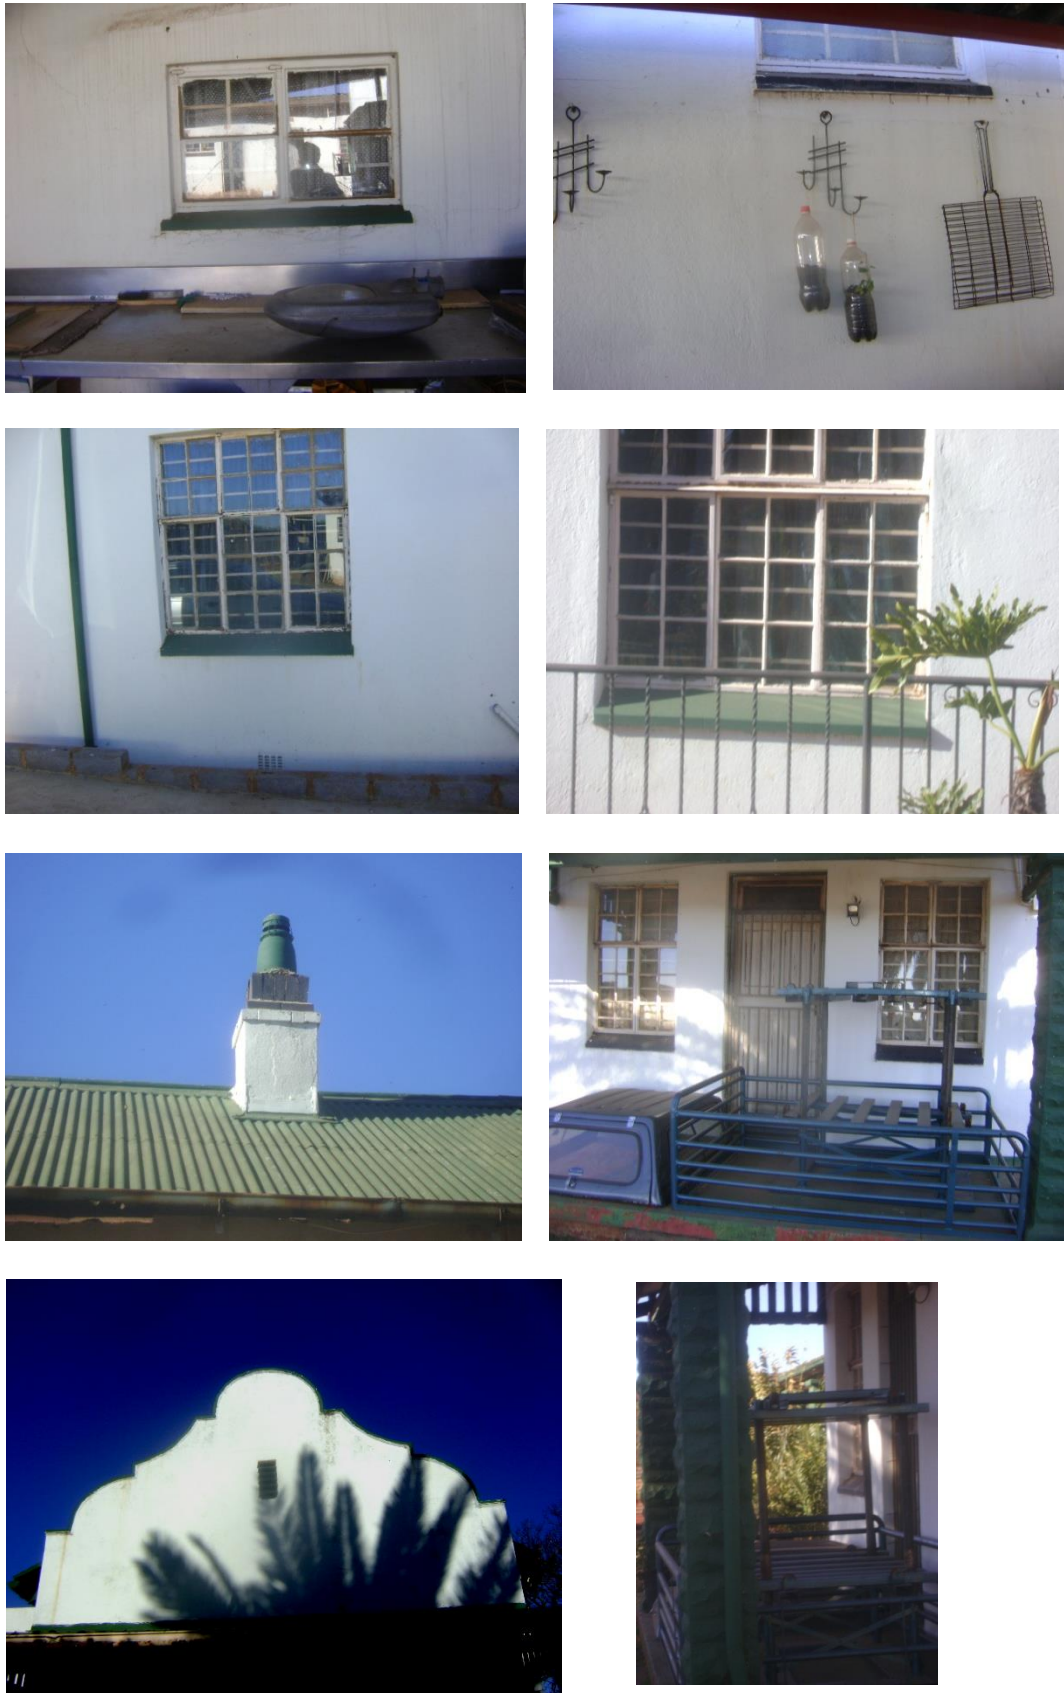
General views of the exterior, elevations and details of the building under investigation. (Photographs S.M. Miller 2016.)
